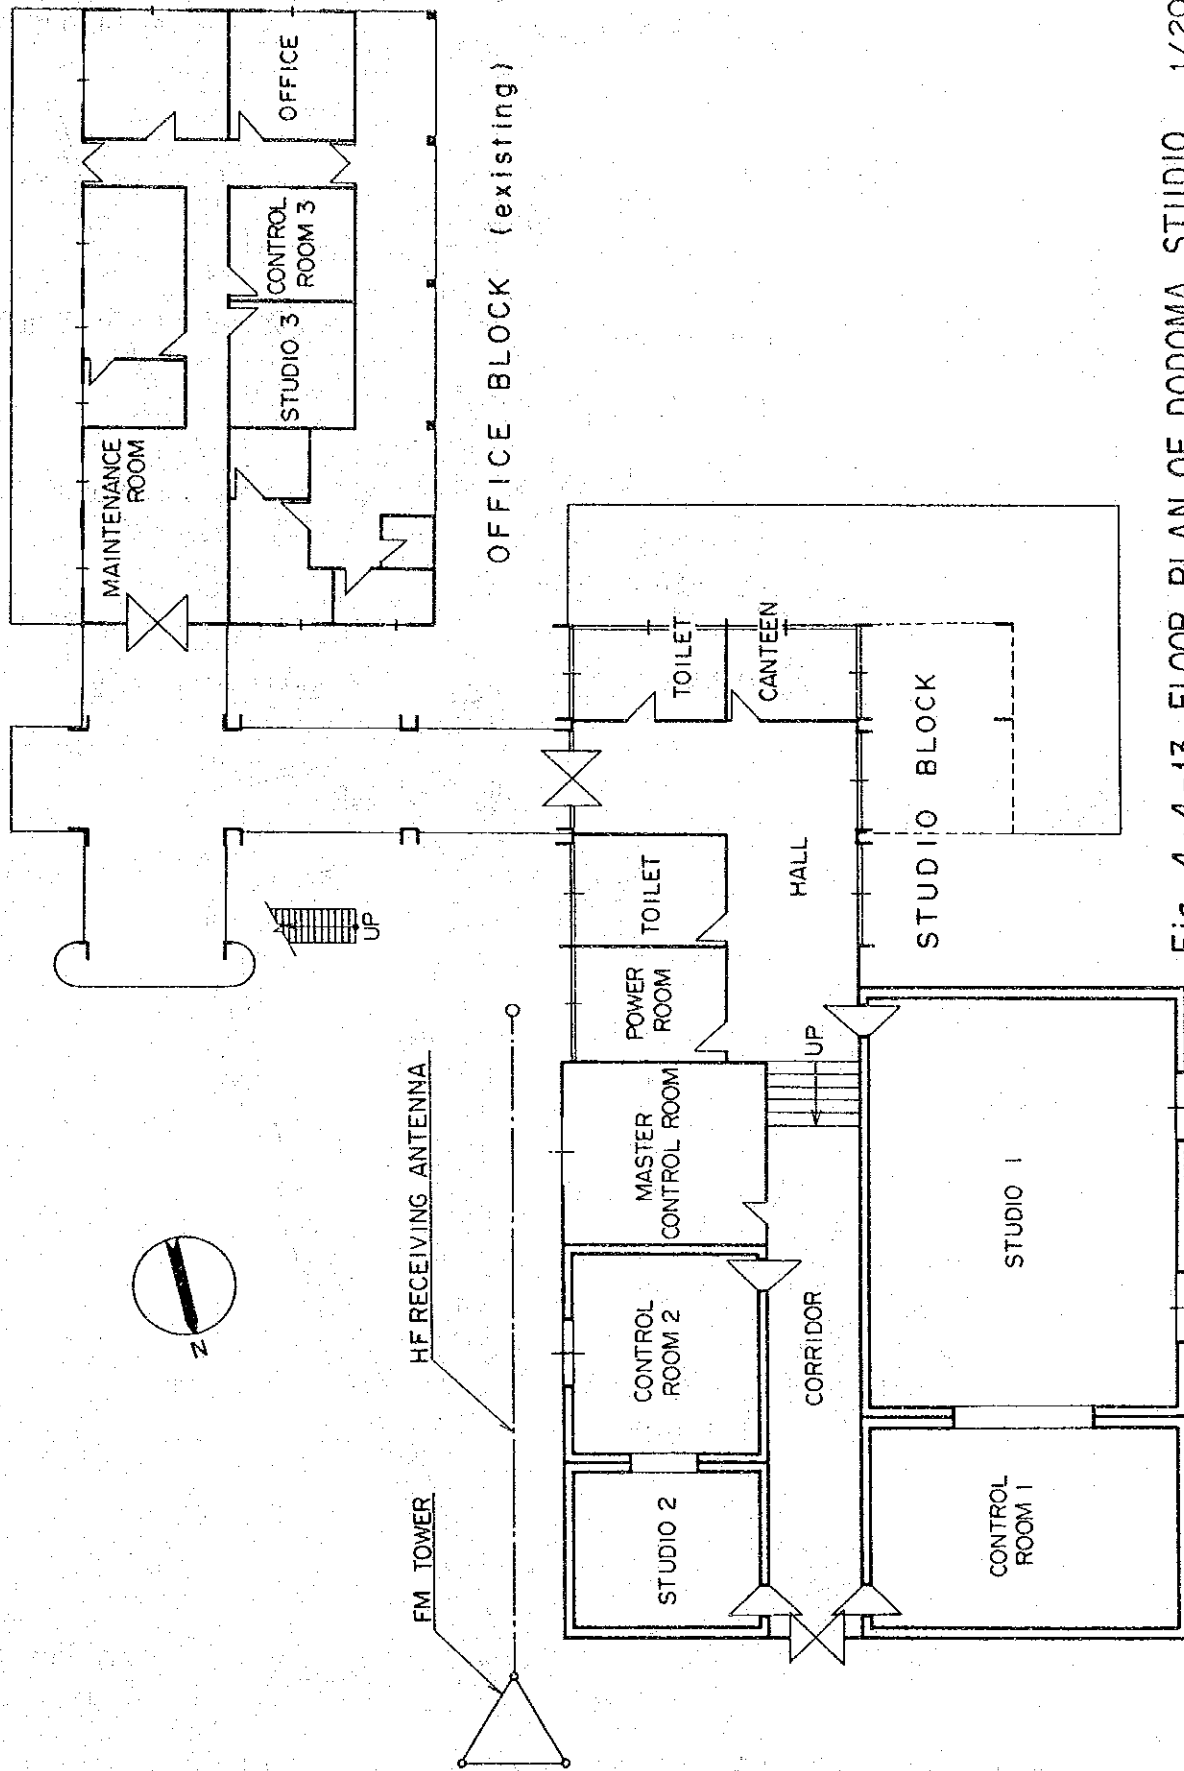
FLOOR PLAN OF DODOMA STUDIO 1/200
